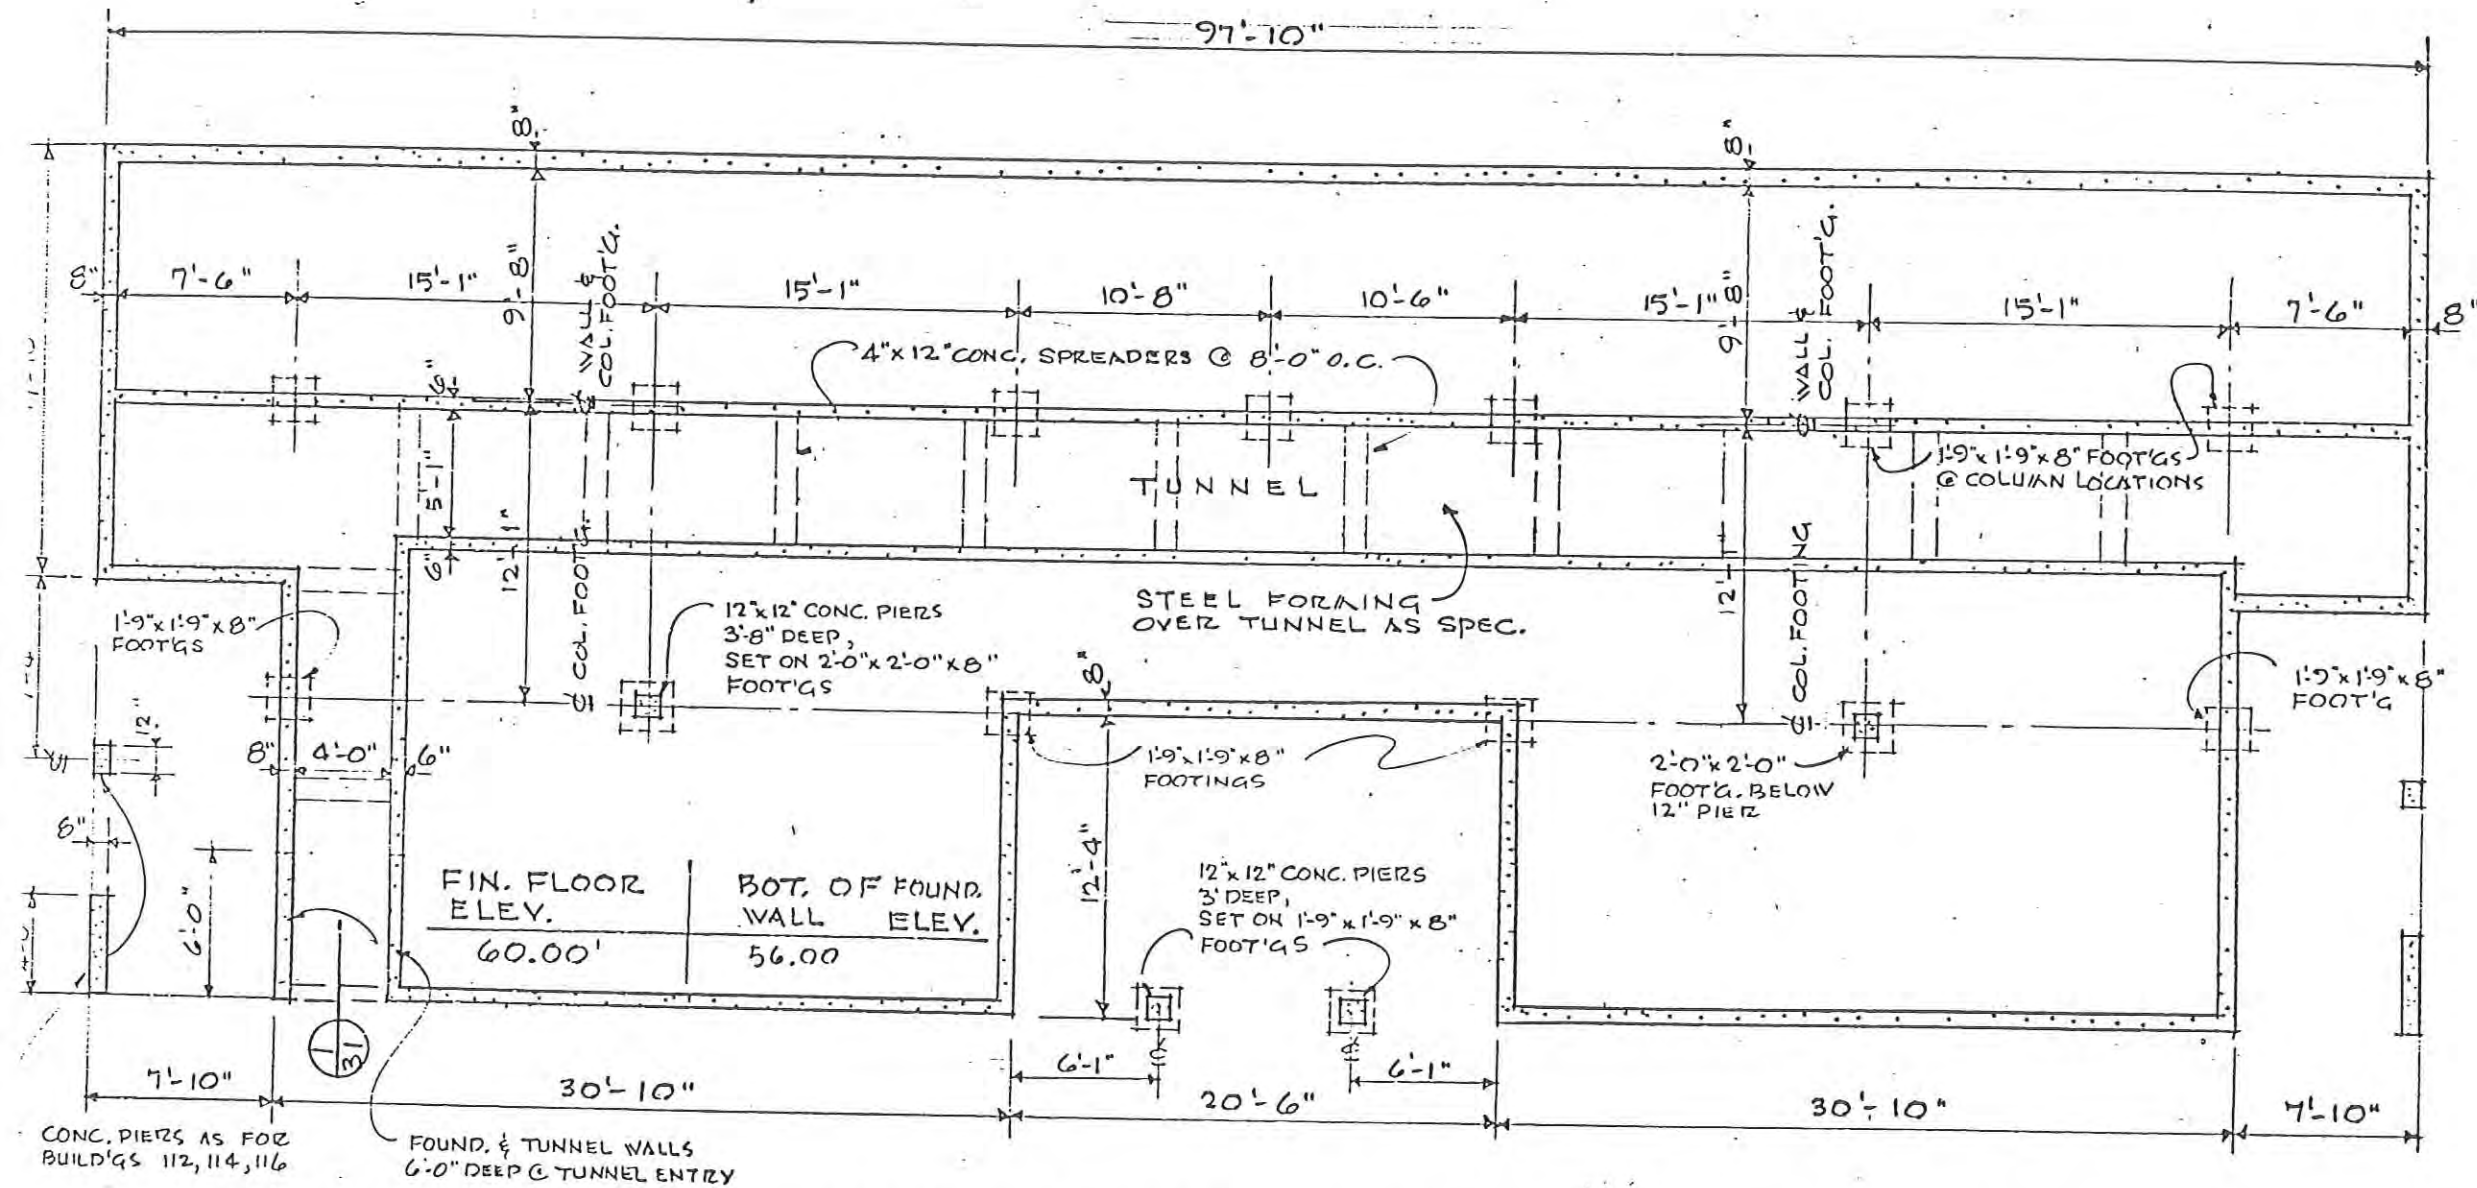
ORIGINAL FOUNDATION PLAN
